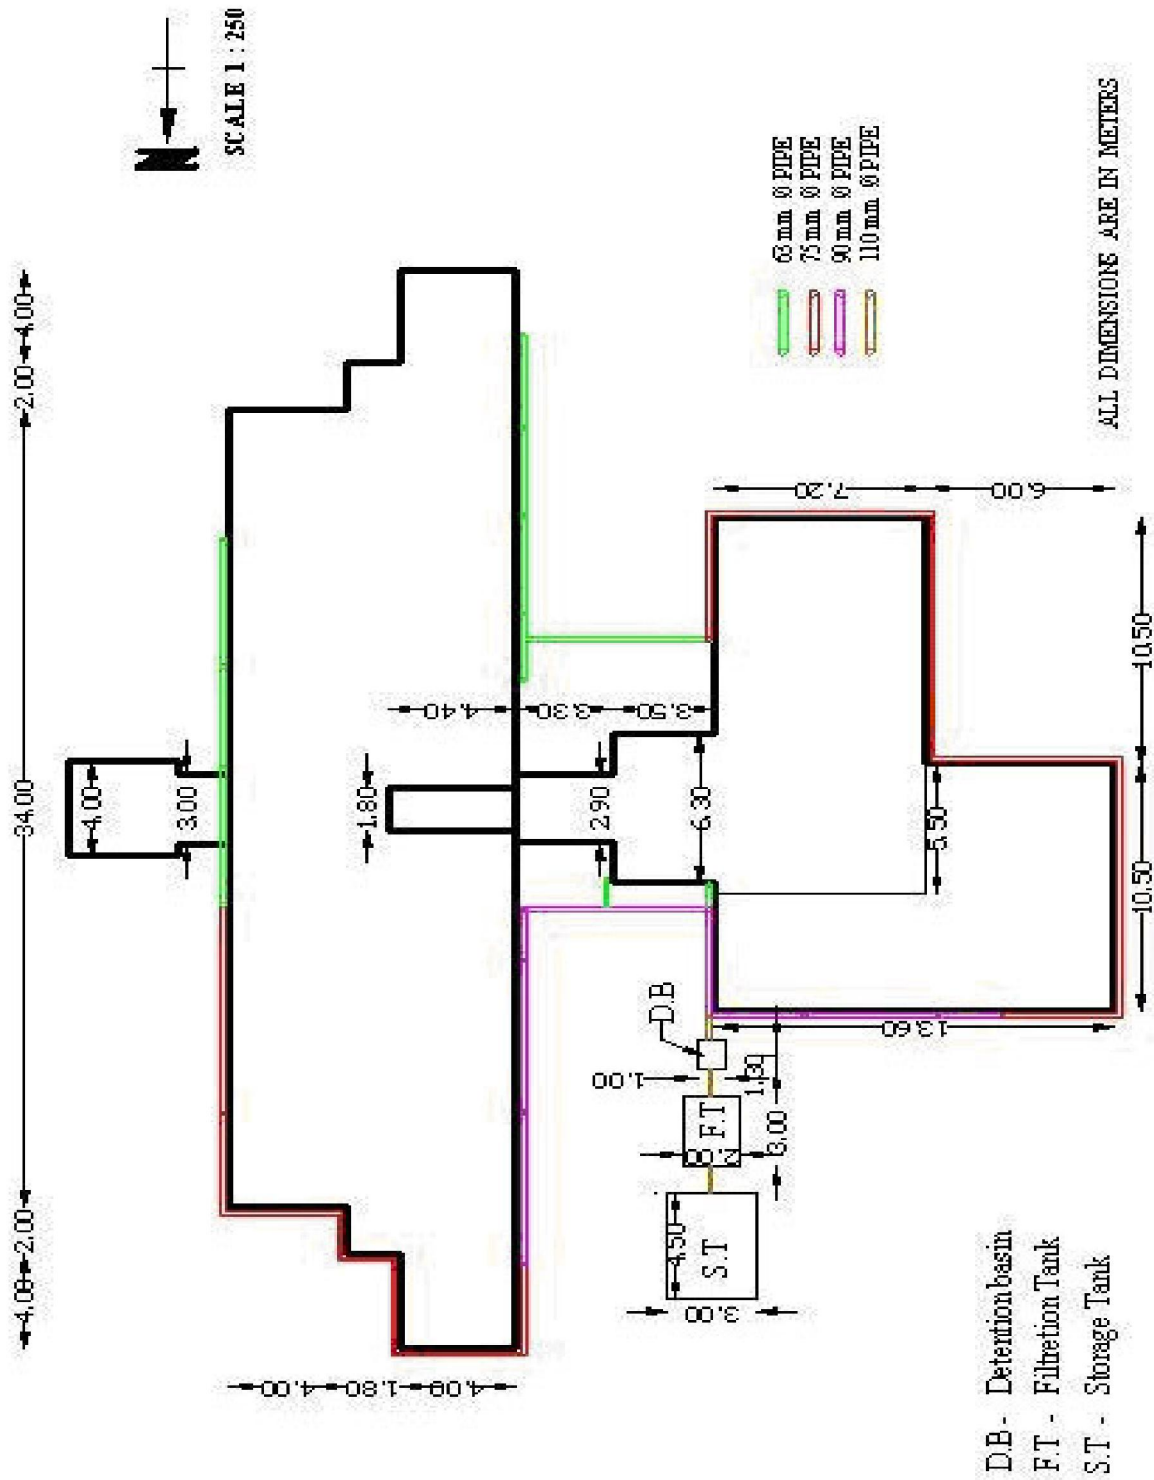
Layout and Design of Rooftop Rainwater Harvesting Systems of Ug Boys Hostel Building.
